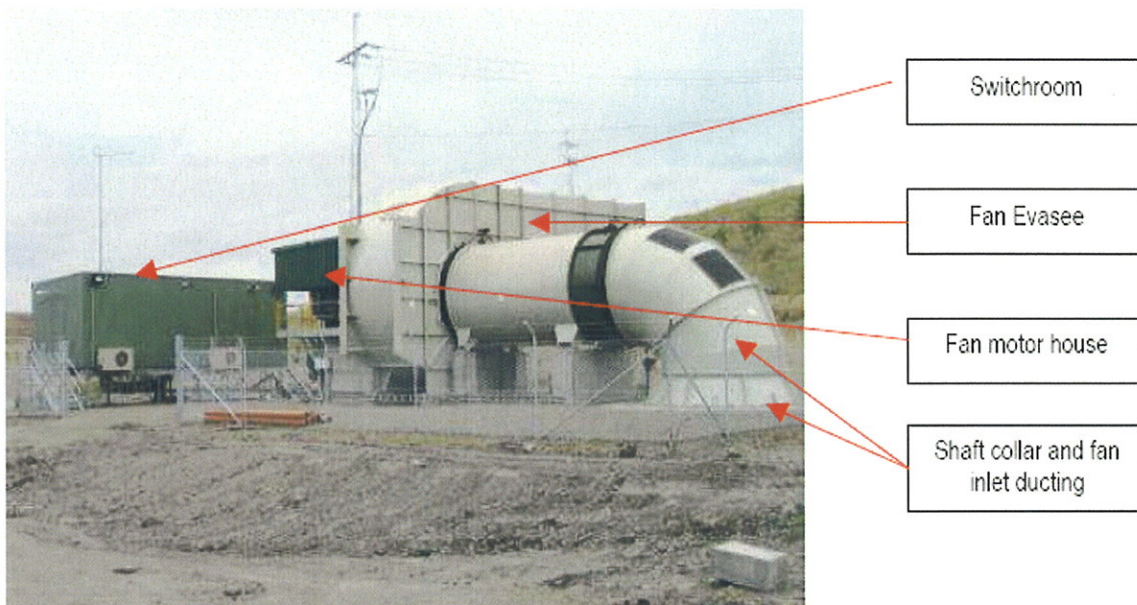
Ventilation fan proposed to be relocated to the new shaft site
